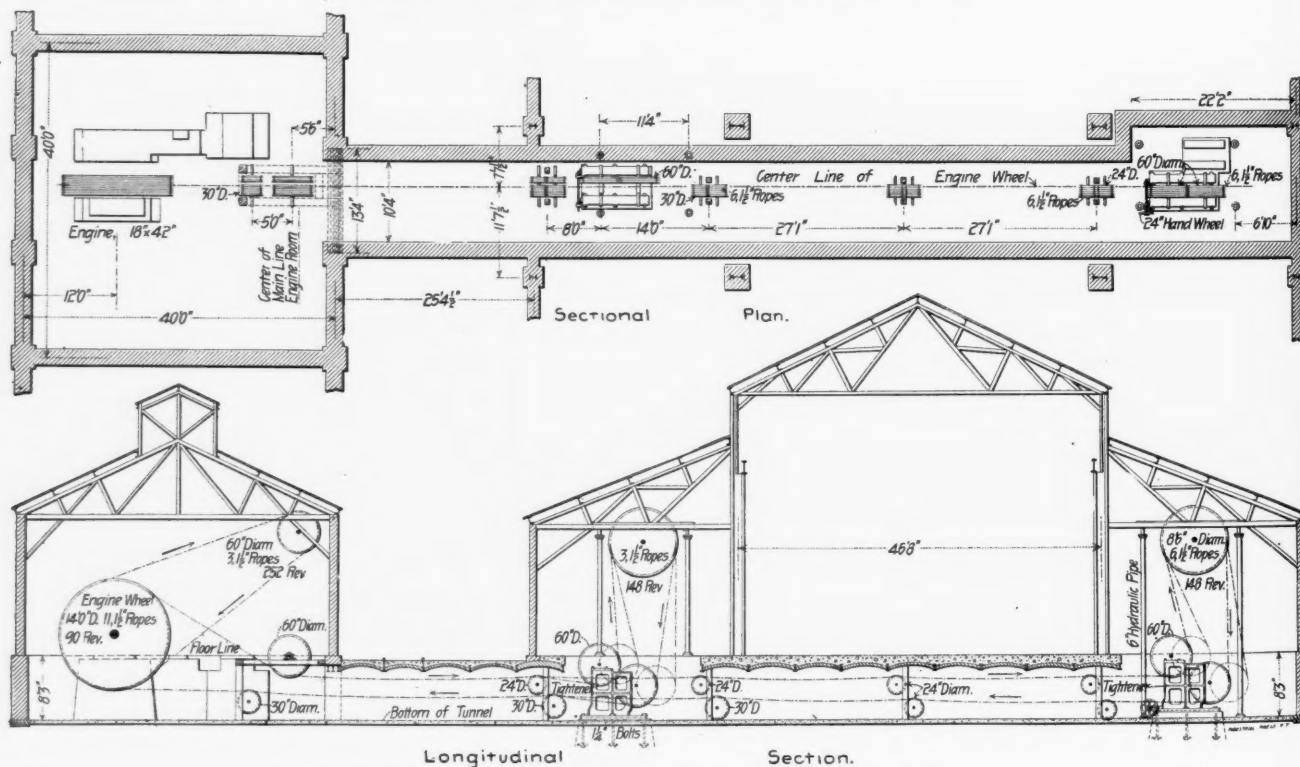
Plan and Elevation of Tunnel and Power Transmission System.
